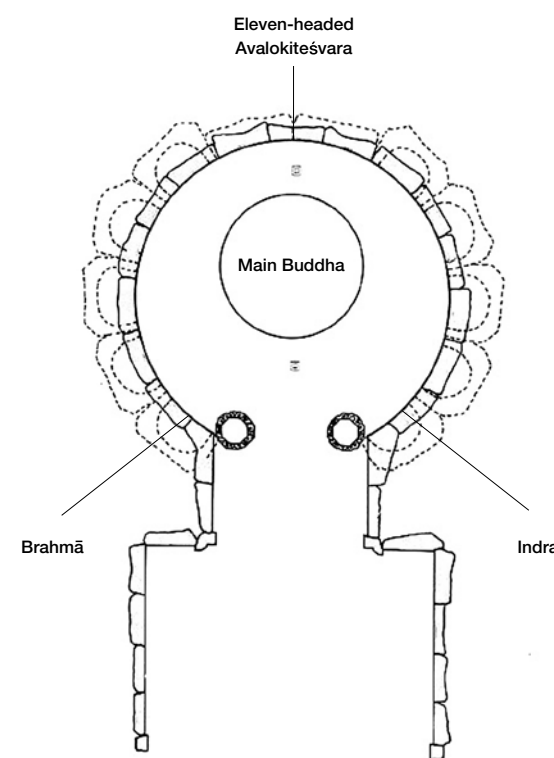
Floor plan of Seokguram Grotto (Edited from the original image in Hwang Sooyoung 1989, p. 40)
